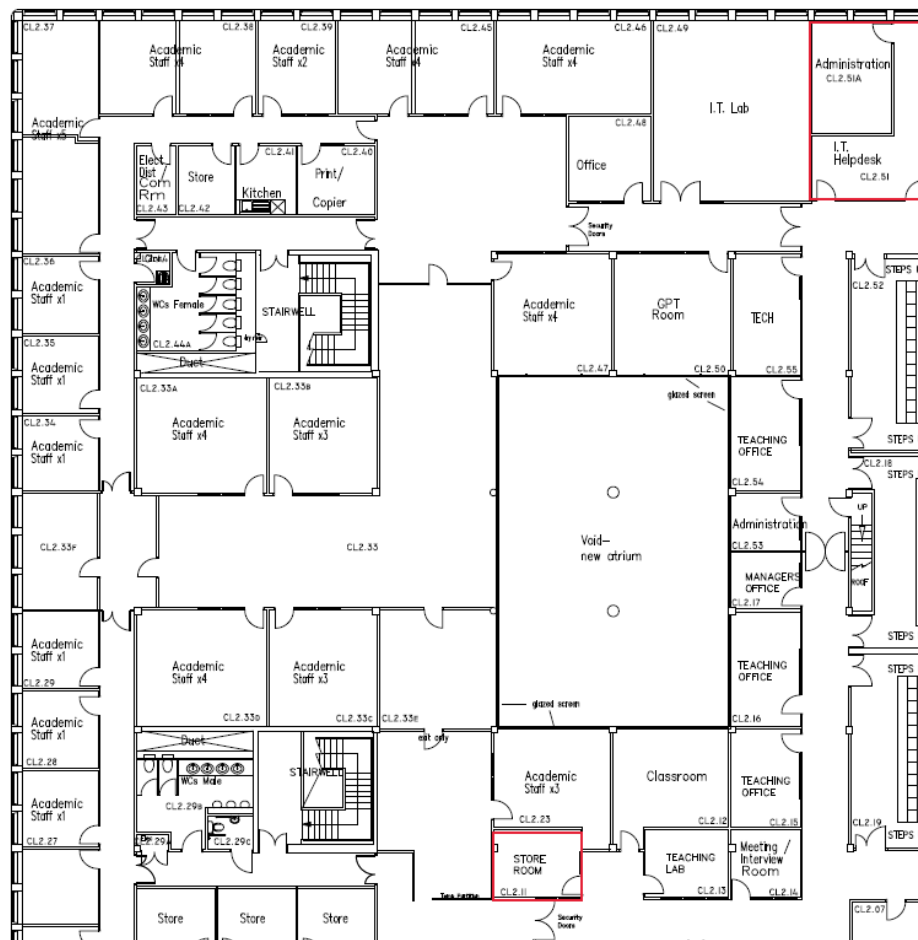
SECOND FLOOR PLANT AT CLARENDON BUILDING WITH HIGHLIGHTED EXCLUDED ROOMS FOR OVERRIDE
